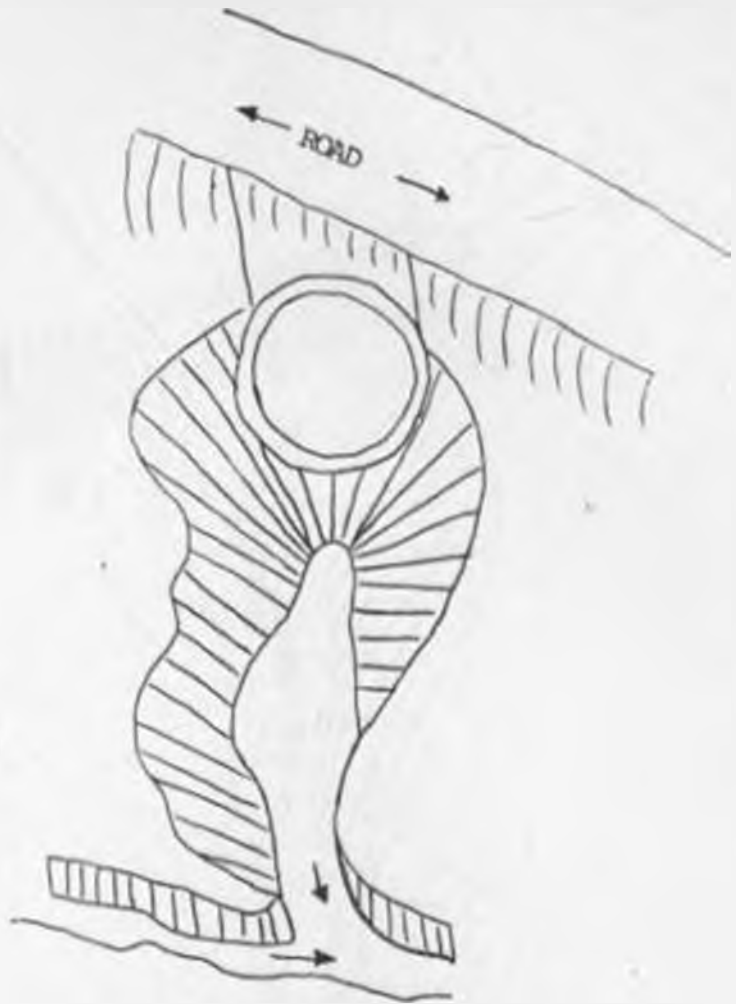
The pipe cross culvert where the more than half kilometer long gully at Kihumbuini, Kandara, starts. The gully is confined to the road reserve even though the adjacent farms' crops are in danger of being washed away.
